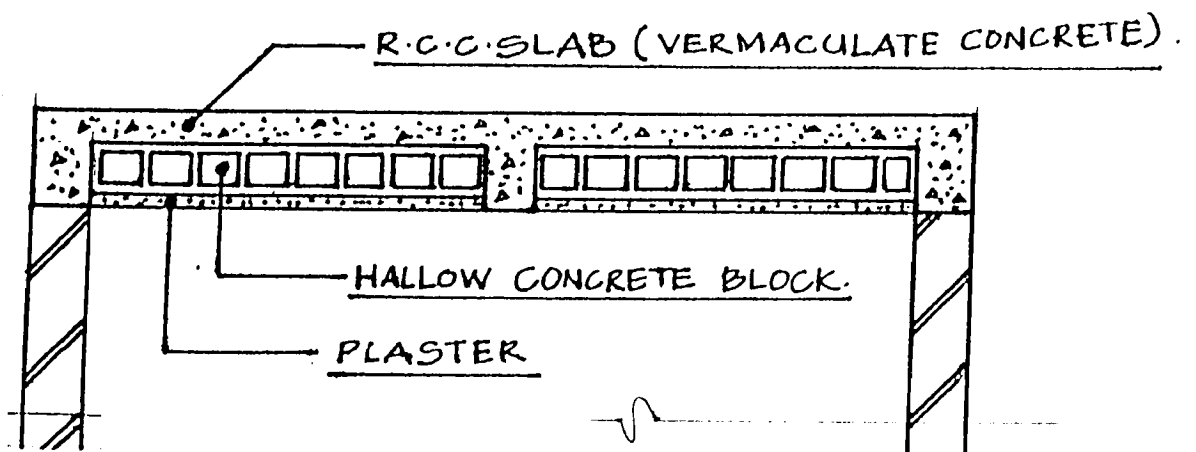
(b) : Figure Shows the Section of Roof and Hallow Block to Minimise Heat Transfer
